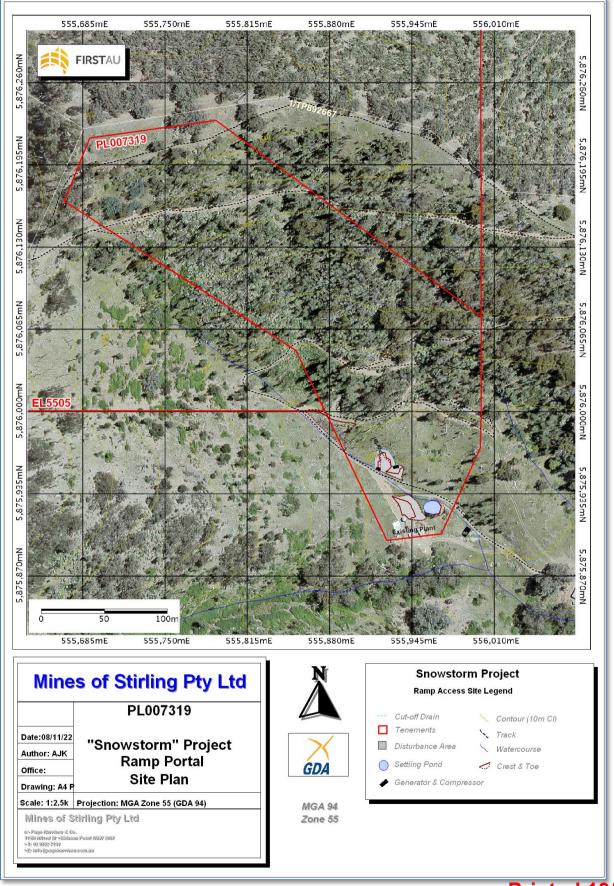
Plan View of Surface Arrangement (at maximum extent).
